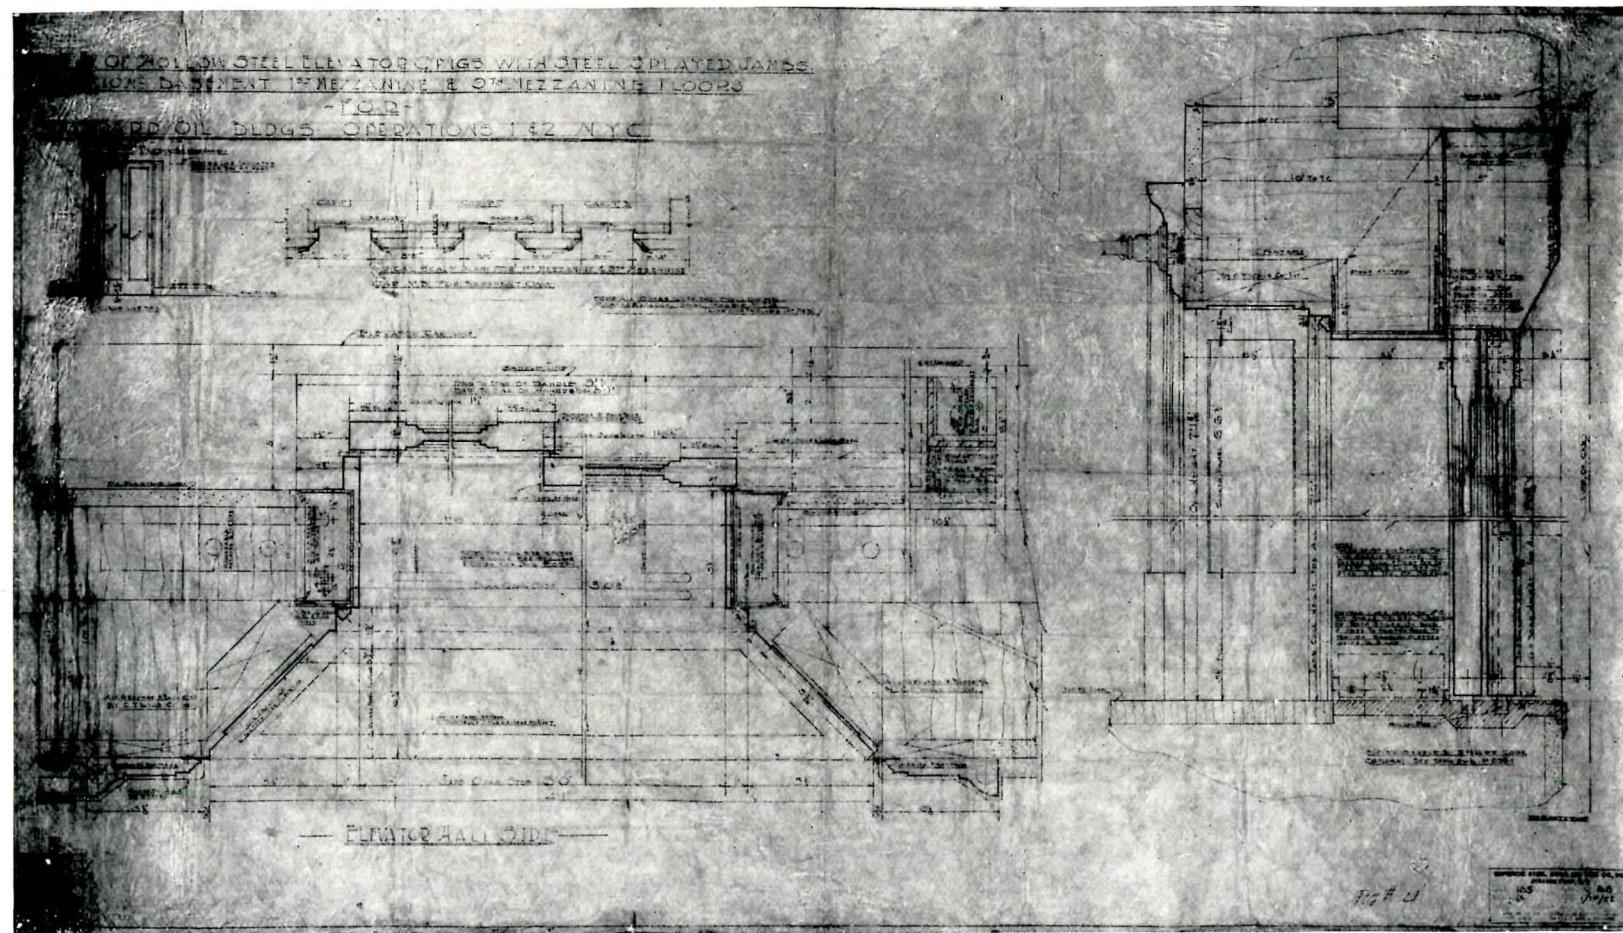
Detail of Hollow Steel Elevator Enclosure with Steel Splayed Jambs. Carrère & Hastings, Architects. Shreve, Lamb & Blake, Associated.
